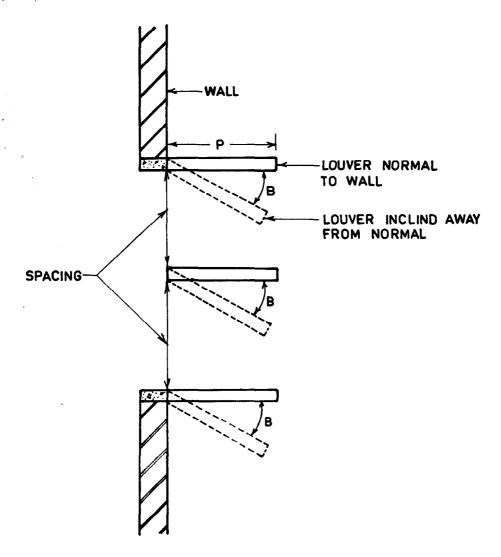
Typical Plan of Louver Showing the Outward Projection and its Inclination
